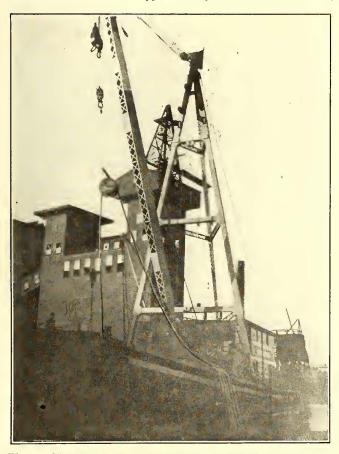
Harlem Cables—Taking Slack Off Reel to Get at Cable End
